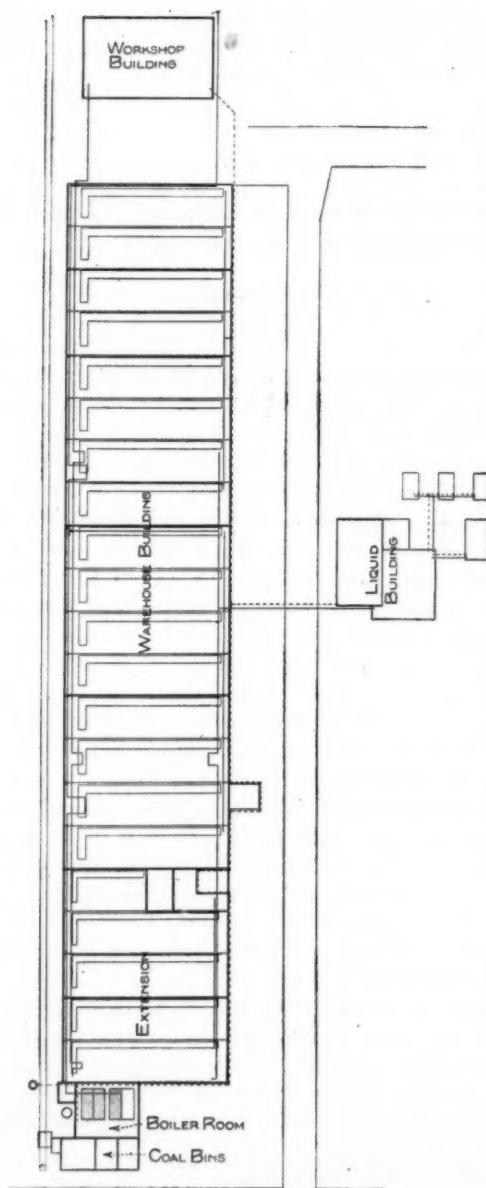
PLAN OF WAREHOUSE AND OTHER BUILDINGS HEATED FROM PRESENT PLANT.
